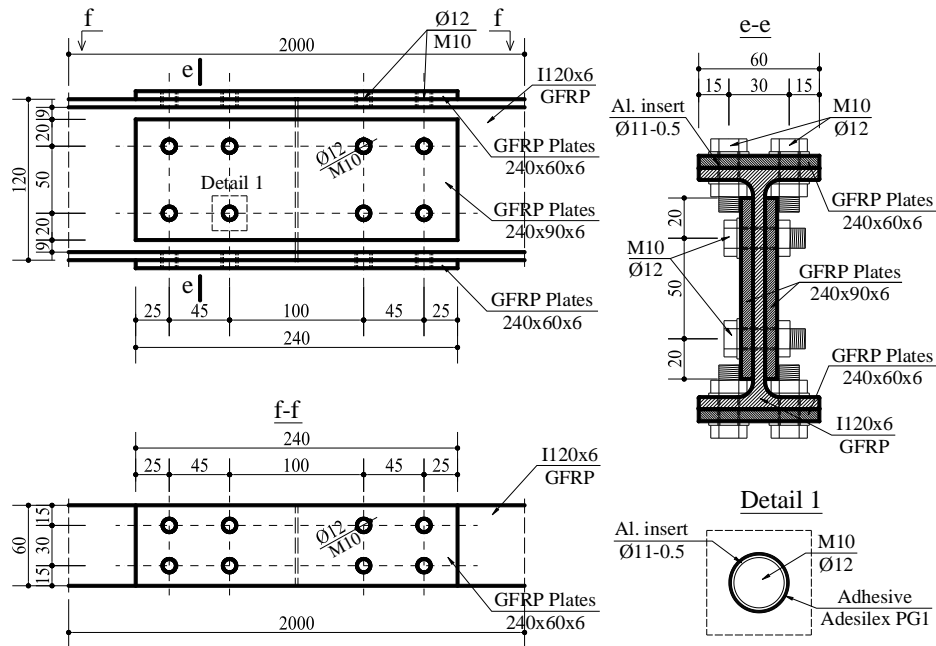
Specimens geometry for S4 series (dimensions in mm).
